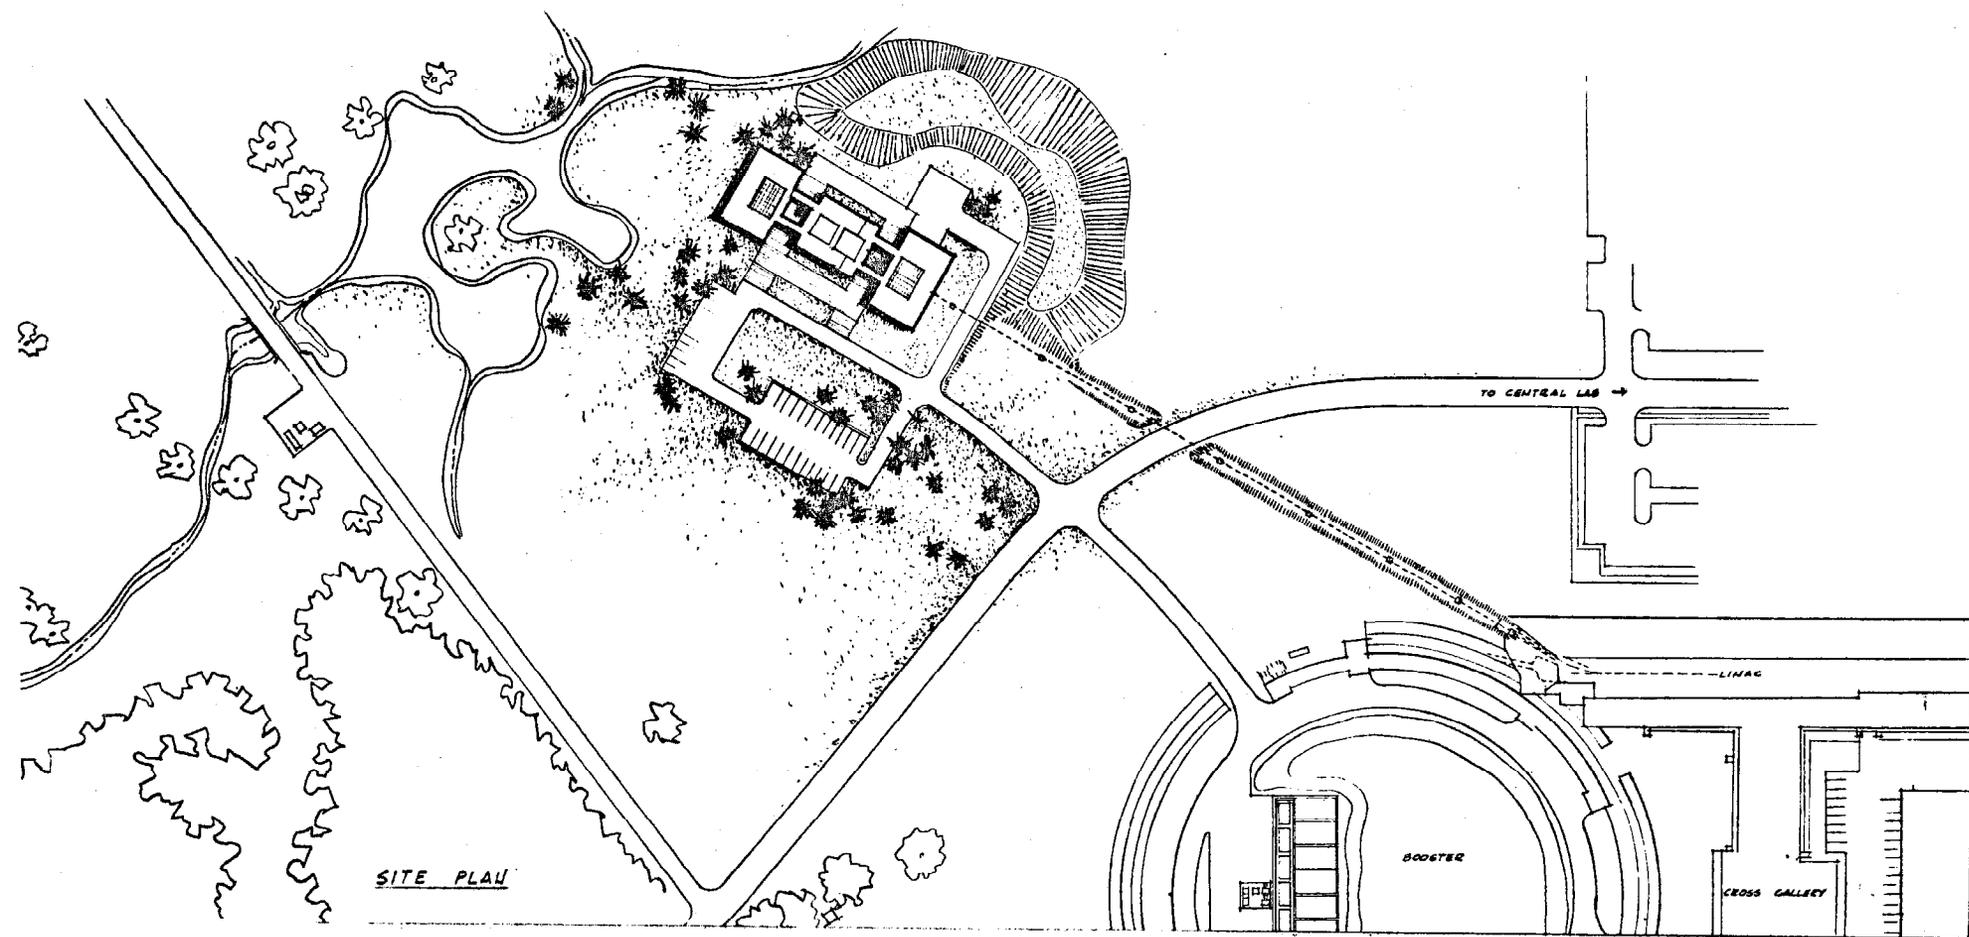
Beam Transport Line Connecting Linac and Medical Facility Buildings
